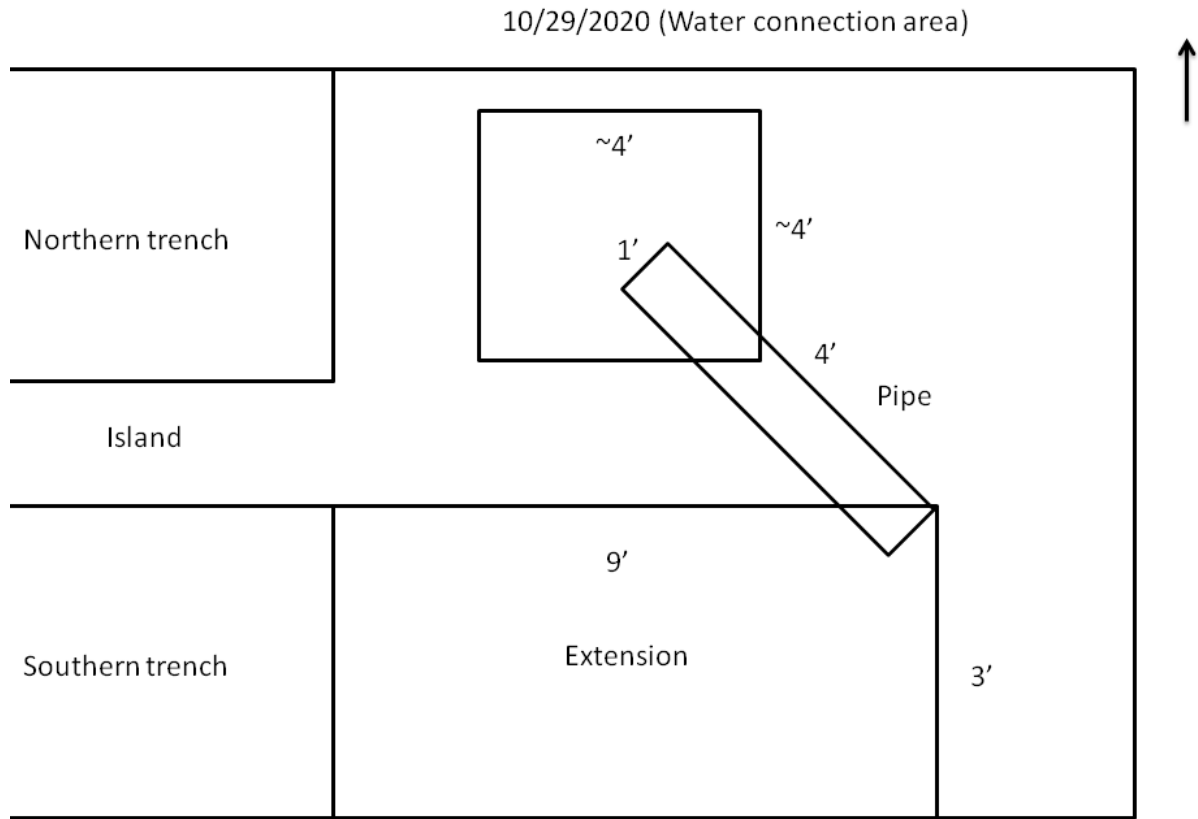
Water connection area pit, showing additional excavations uncovering old unmarked utilities
